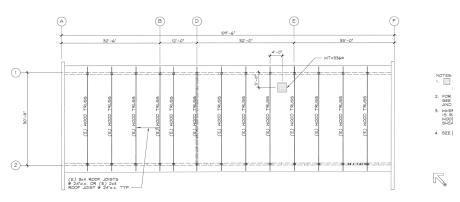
BUILDING 7: 2017 HVAC Upgrade Roof Framing Plan
